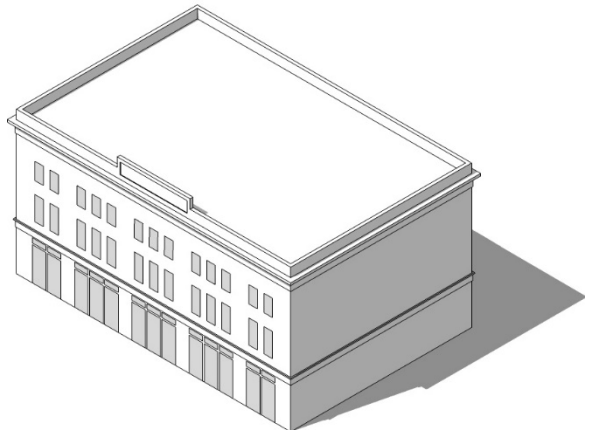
f.3.ii.c Flat Roof with Parapet
